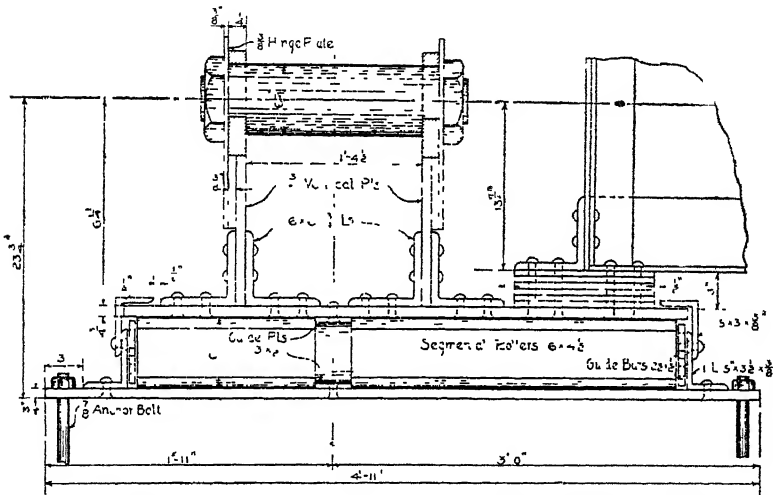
Type of Bearing Construction where End Floor-Beam Does Not Rest Directly on Bearing or Masonry Plate. Grillage of Iron Bars Used instead of Cast-Steel Pedestal.
